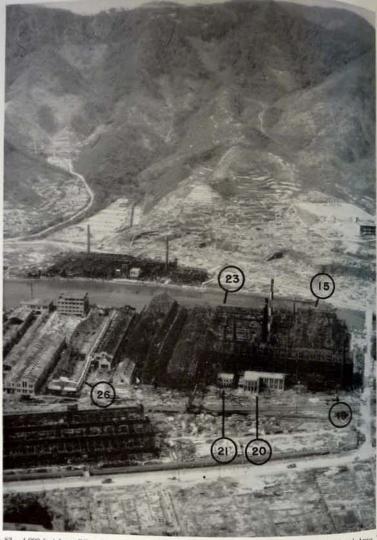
Group 12. General view looking northwest from Urakami River bridge.
